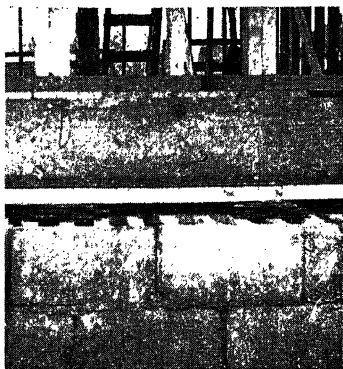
A.—Careless work in laying foundation. The top is not level, and will not give proper support to the frame. (Courtesy of Alexander Houses, Inc.)
